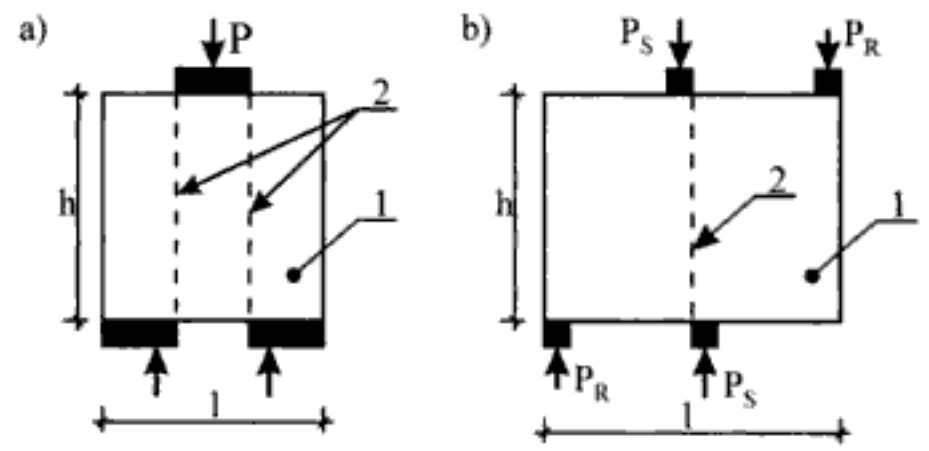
Set-up of shear tests on single brick specimens: a) two planes of shear failure, b) single plane of shear failure, 1 – brick, 2 – shear planes.
